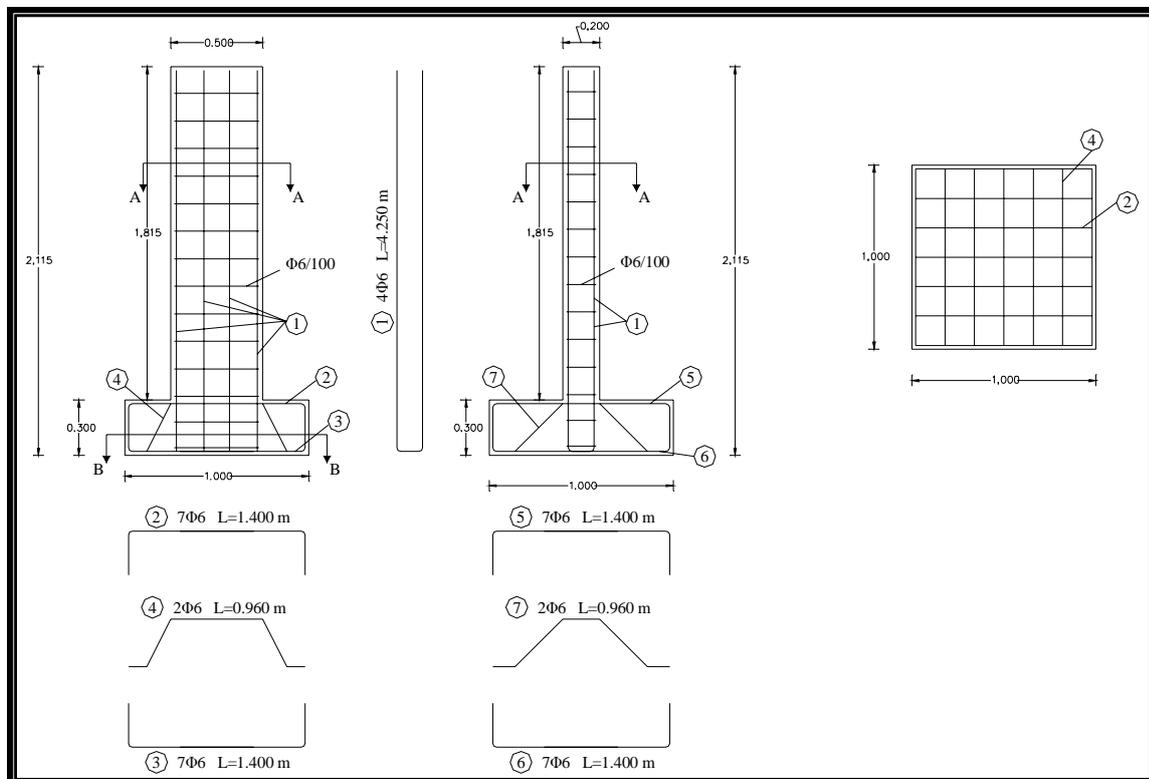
Structural details of Bridge Pier Model (see also Manos 2004)
